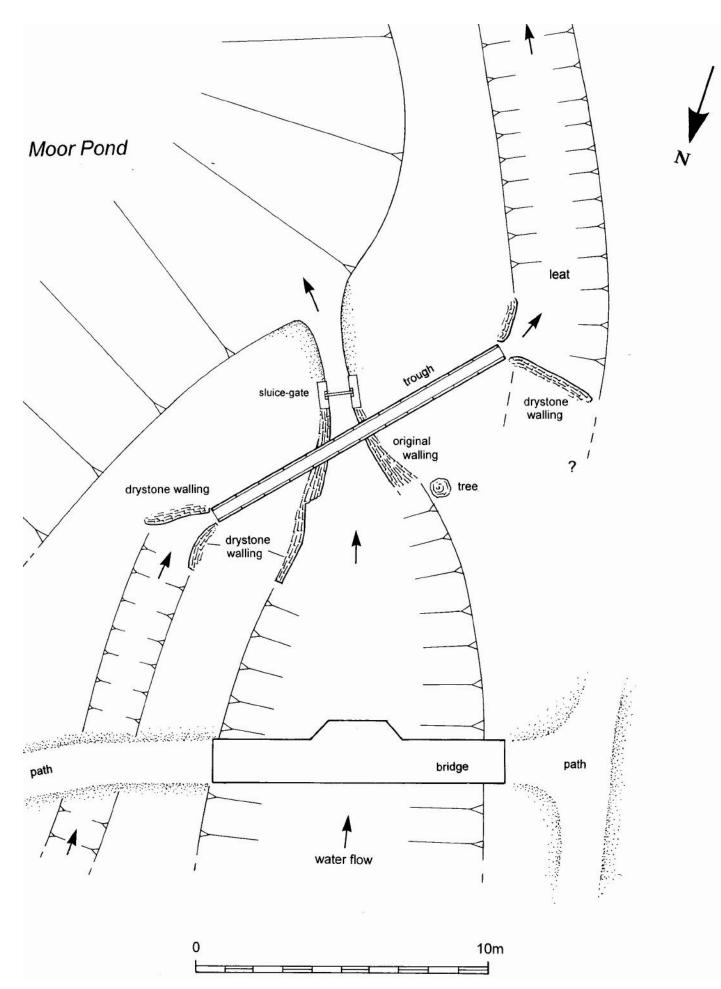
Plan of Sluice 1 at the north-west corner of Moor Pond, Papplewick, showing original Phase I walling and later Phase II drystone walling and the line of the associated trough or launder that crossed over the approach to the sluice-gate. Scale 1:125.
